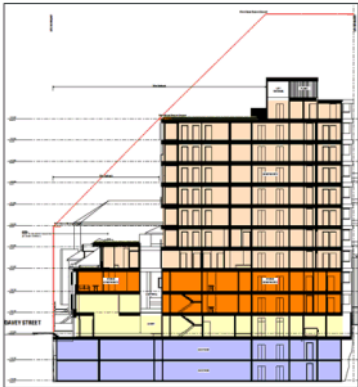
Eastern elevation illustrating the permitted building envelope (source: JRM Architects)
